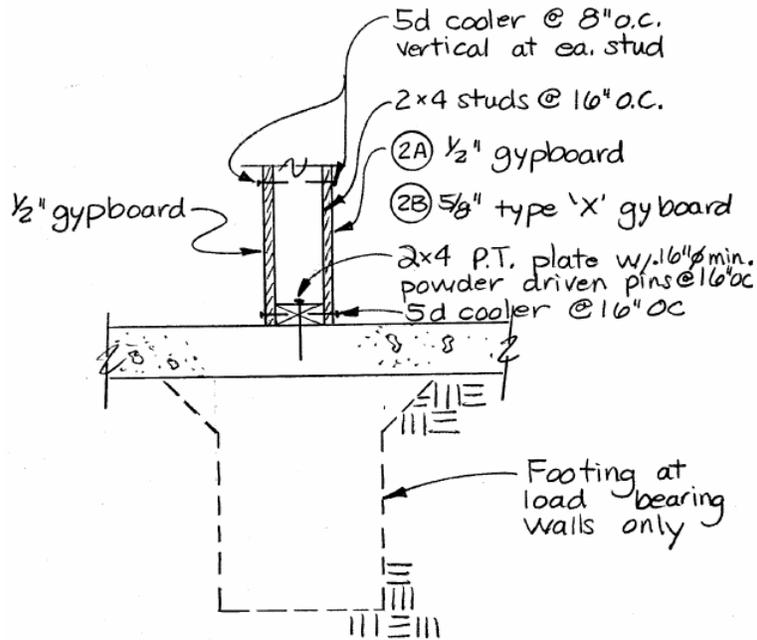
Index building 6 interior footing section (detail 2-S2)
